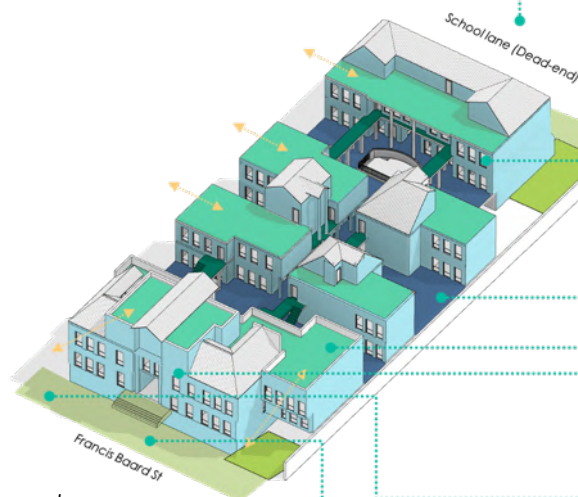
Site axonometric and diagram illustrating existing zoning, circulation, and layout (Author, 2021).
